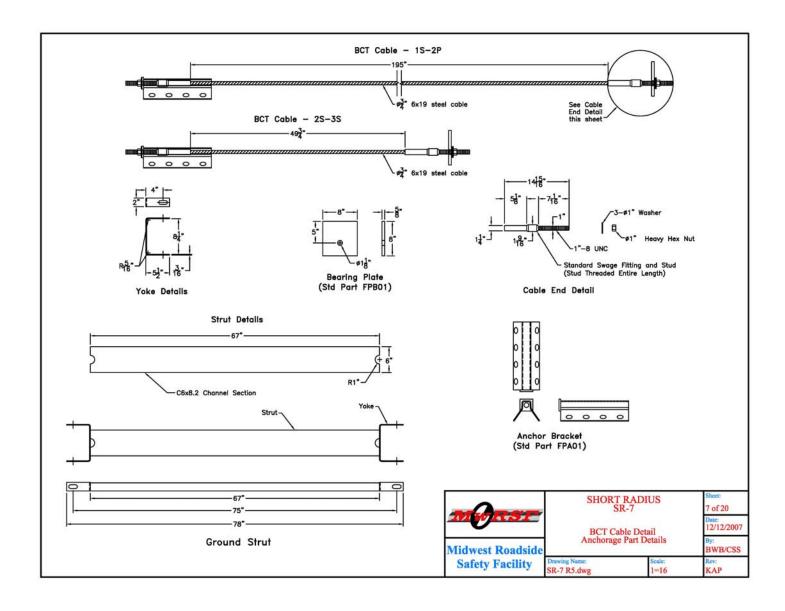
BCT Cable Detail and Anchorage Part Details (English)
